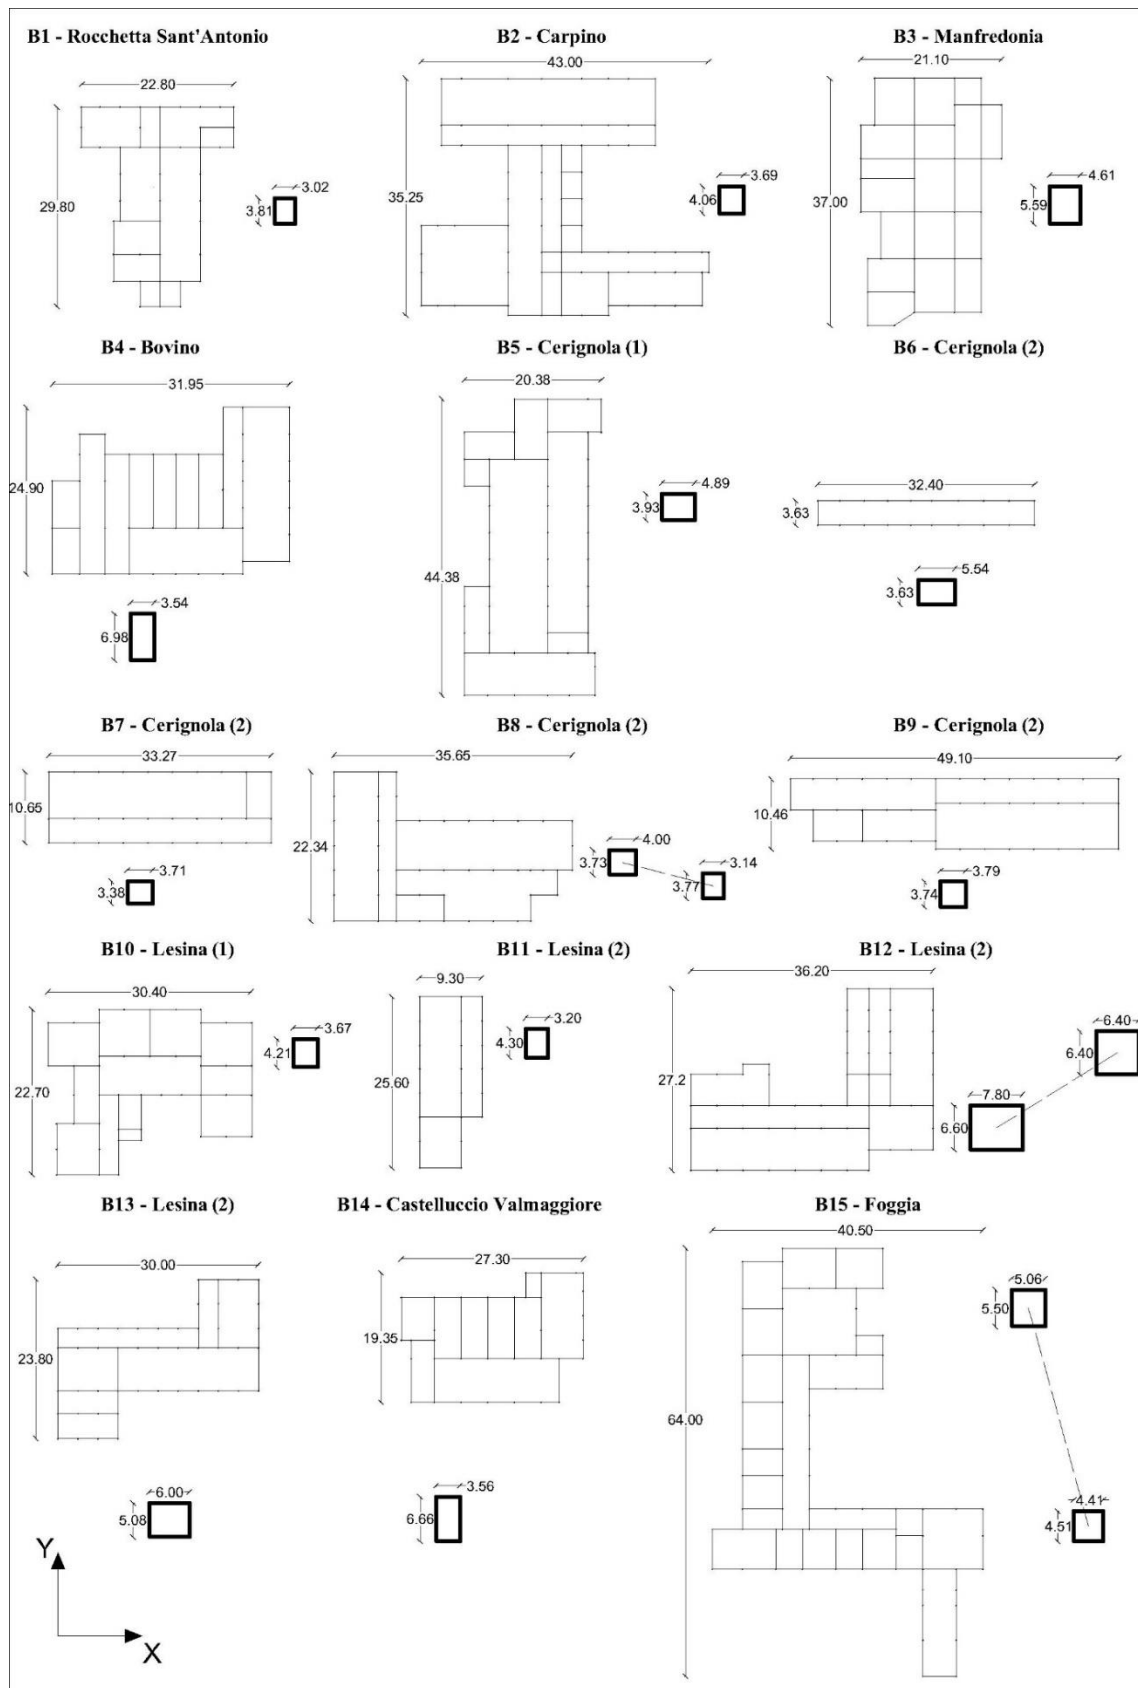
Building plans and tavolino models for the 15 existing RC school buildings of Foggia, Italy.
